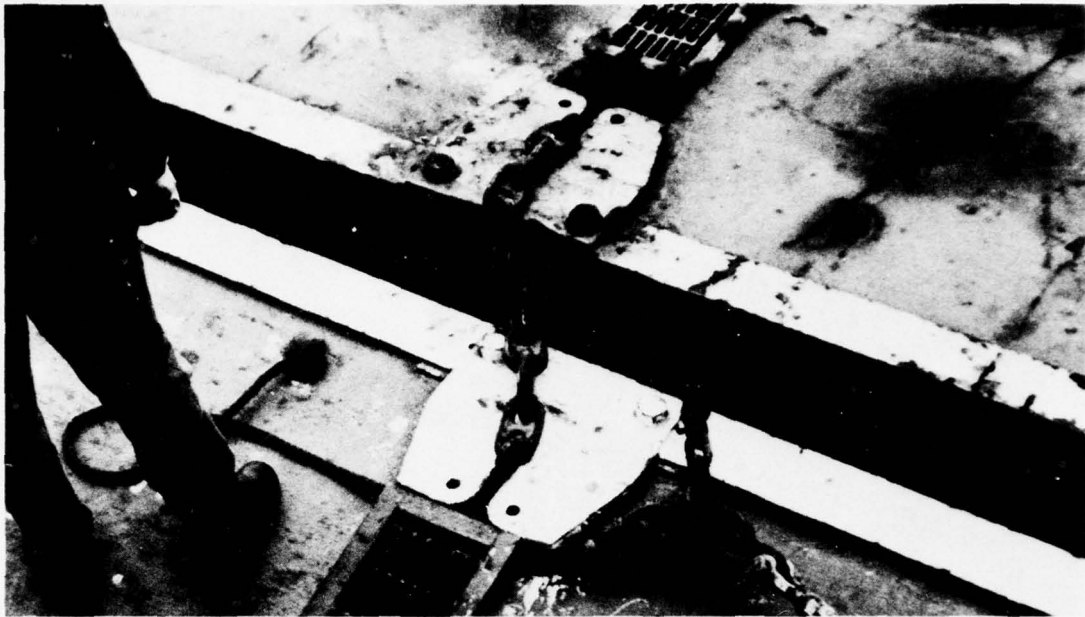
Chains used with standard causeway chain plates to hold causeways together.
